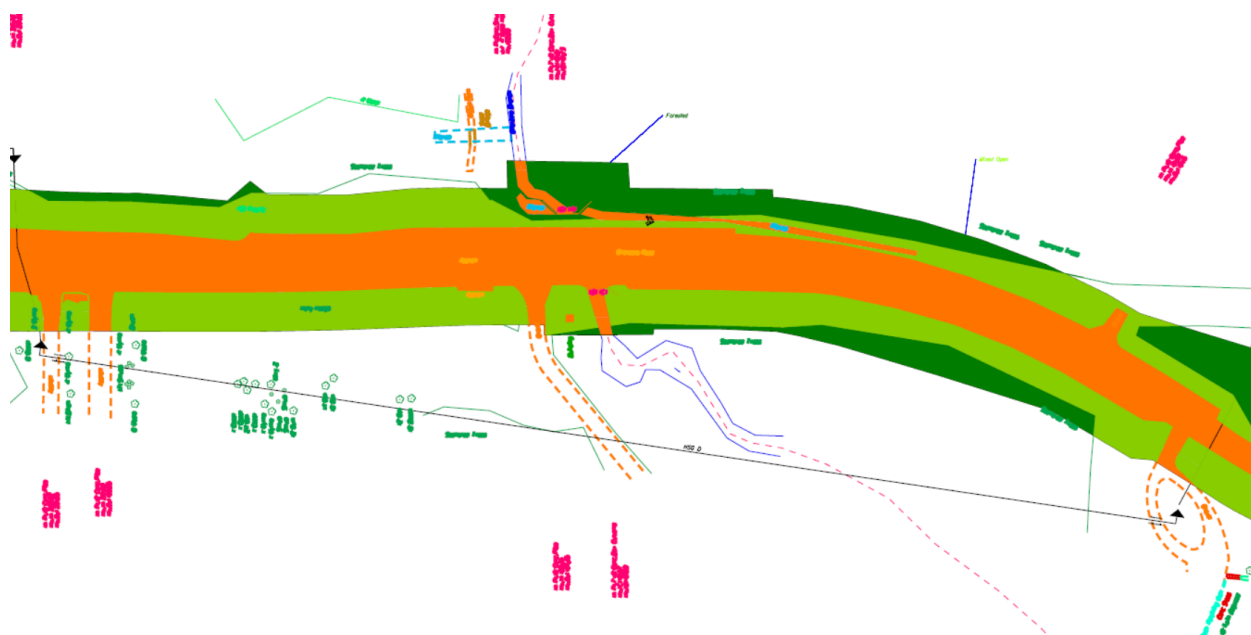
Revised Plan View of Existing Conditions Land Types Close View Over Creek Crossing
